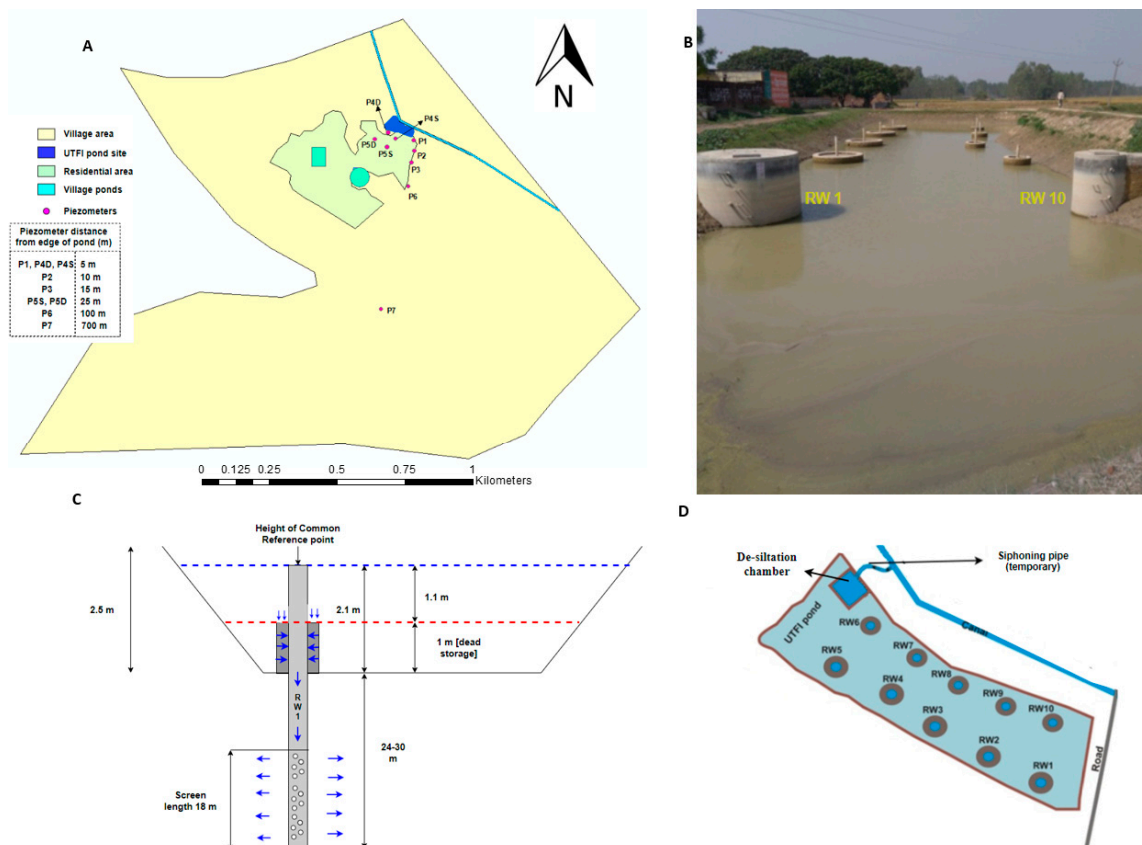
(A): The location of the UTFI pond and the installed piezometers at the pilot site (P1 to P7 = piezometers); (B): The completed UTFI pilot site; (C): A simplified vertical cross section of the UTFI pond; (D): A schematic of the pond showing the locations of recharge wells within the pond (RW1 to RW10 = recharge wells).
